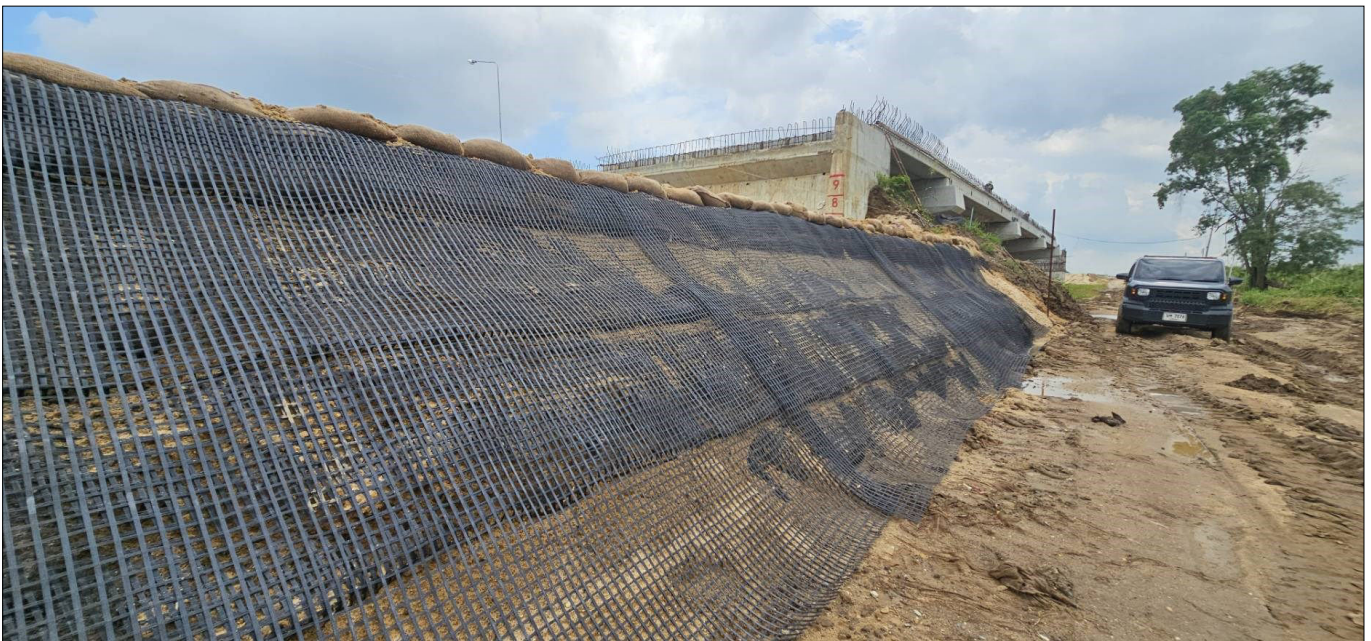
& 5 : During Construction – Reinforced Soil Embankment Execution in Progress
